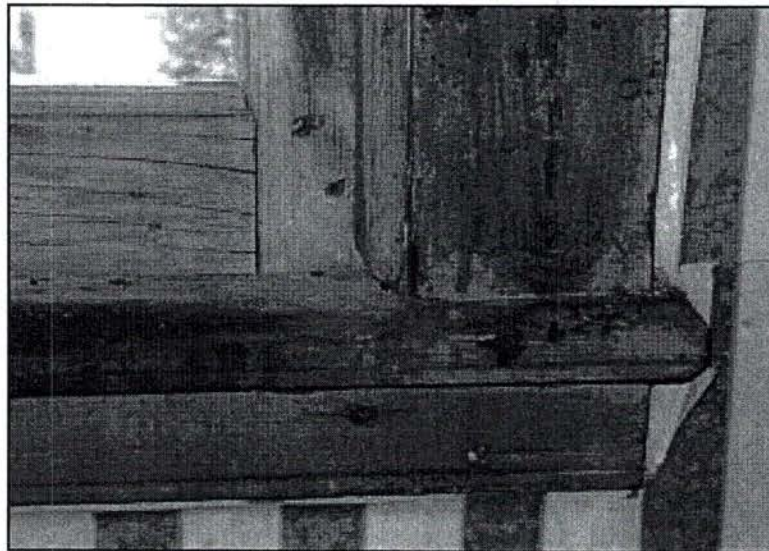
Detail of wood at window frame in Room 208 with signs of deterioration.
